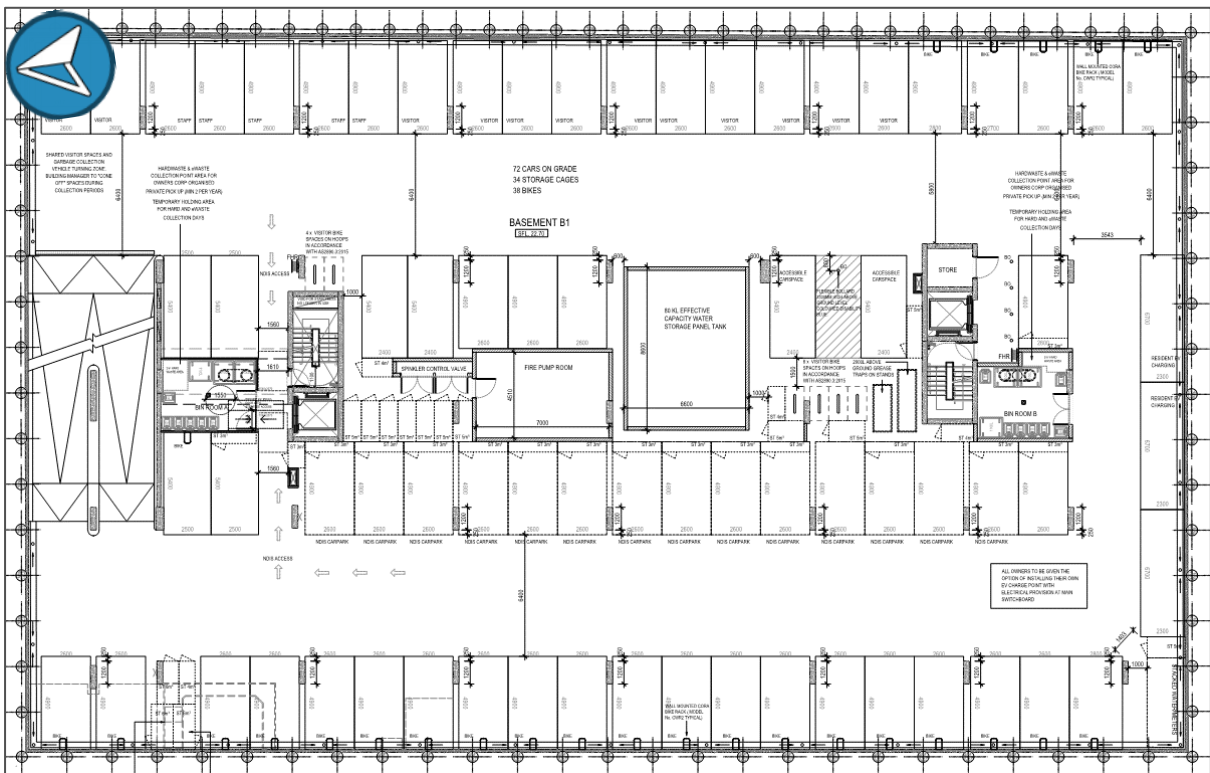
Proposed Floor Plans – Basement 1 (Image Source: Artisan Architects)
